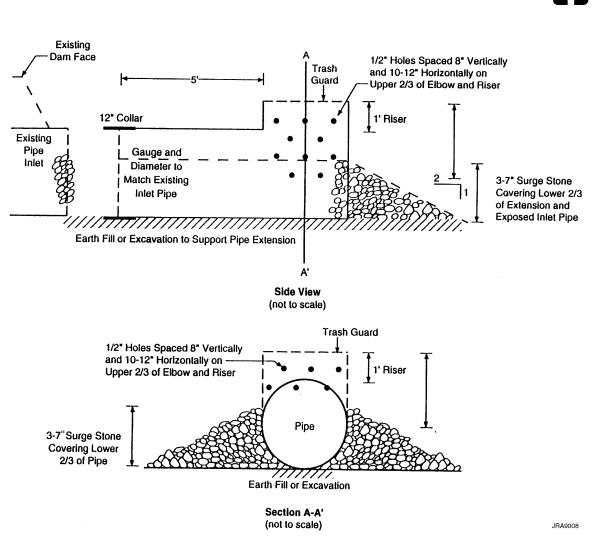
Construction Details for Check Dam Culvert Pipe Extensions in Section B
